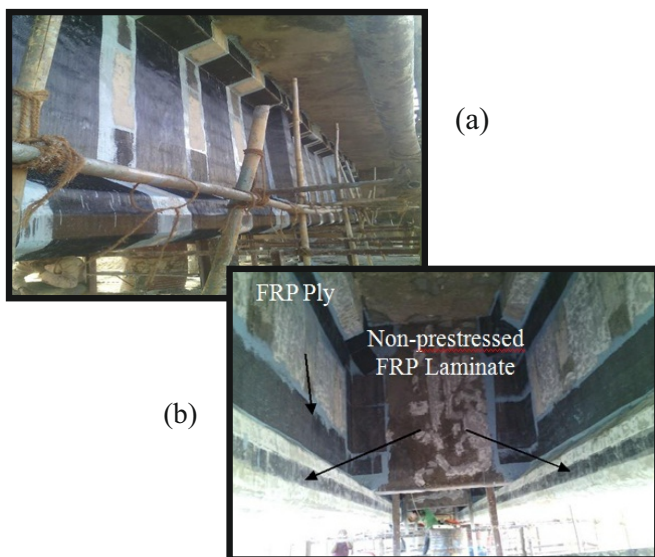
FRP Retrofitting of Ratlam railway bridge girder. (a) U- Wrap FRP applied to PSC I girder. (b) FRP ply and non-prestressed laminate applied to inner side face of PSC I girder
